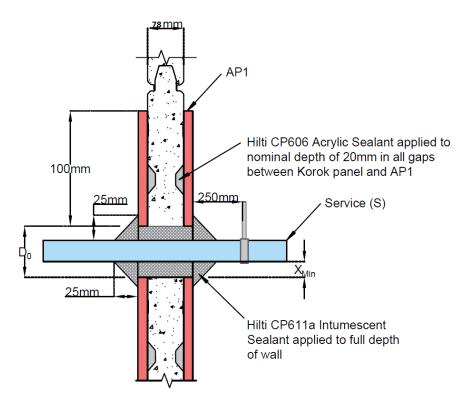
Gas and water supply Pipes through 78 mm Korok wall system with AP1 and cone additional protection
